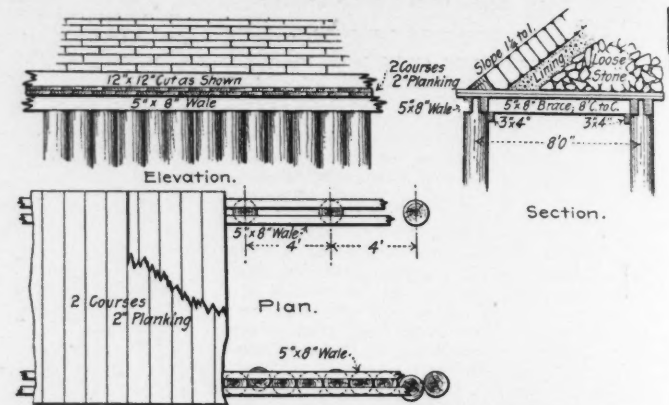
METHOD OF UNDERPINNING SLOPE WALL THROUGH JORDAN LEVEL MARL BEDS.
